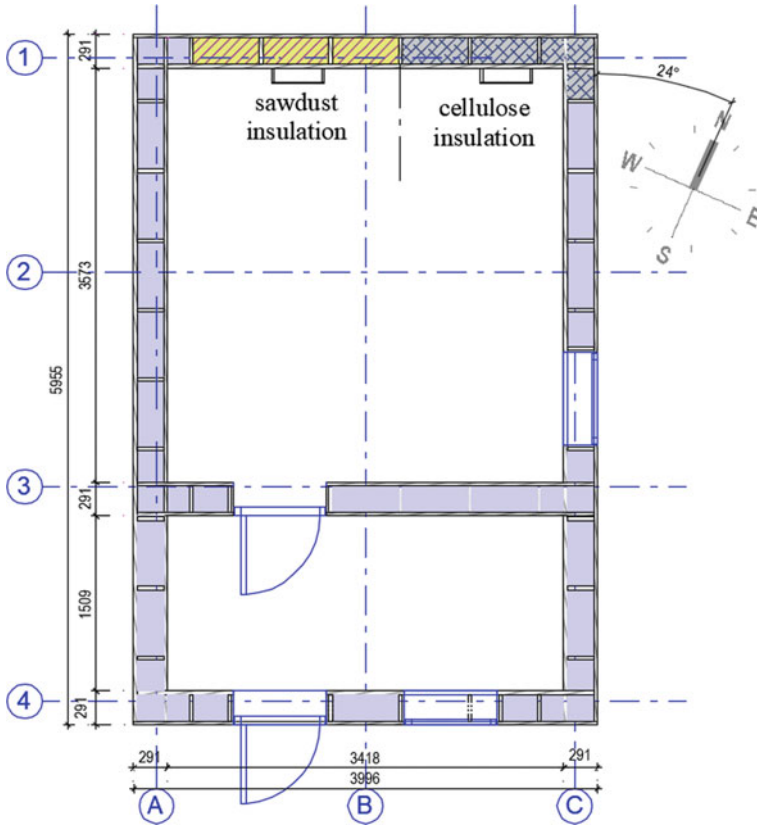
The plan of the test house and the placement of elements insulated with sawdust and cellulose
